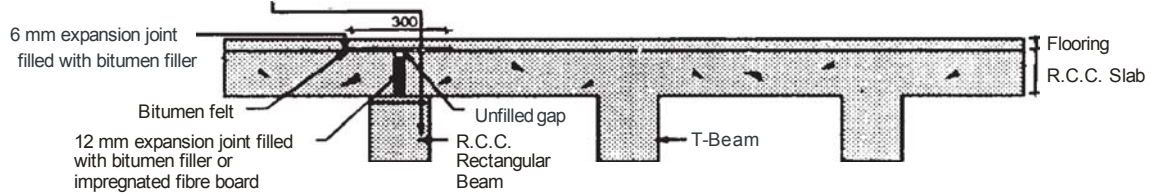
Slab & T-Beam Construction of Long Length
